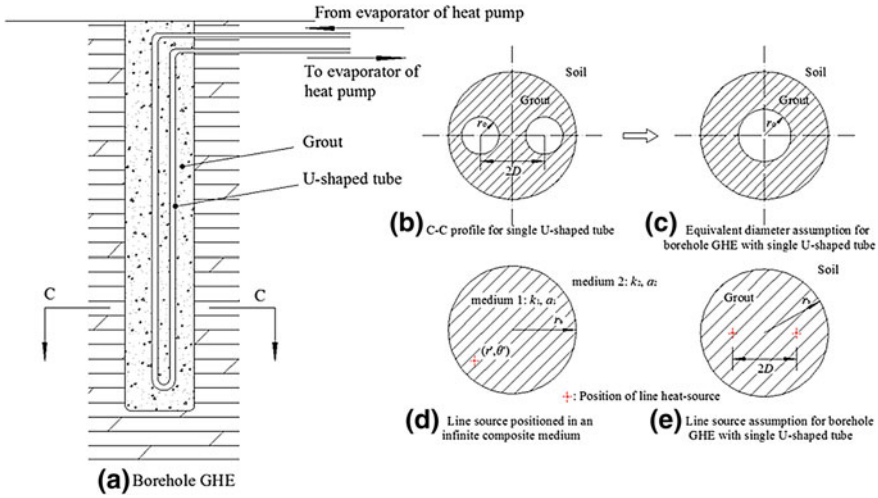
Schematic layout of borehole GHE with a single U-shaped tube
